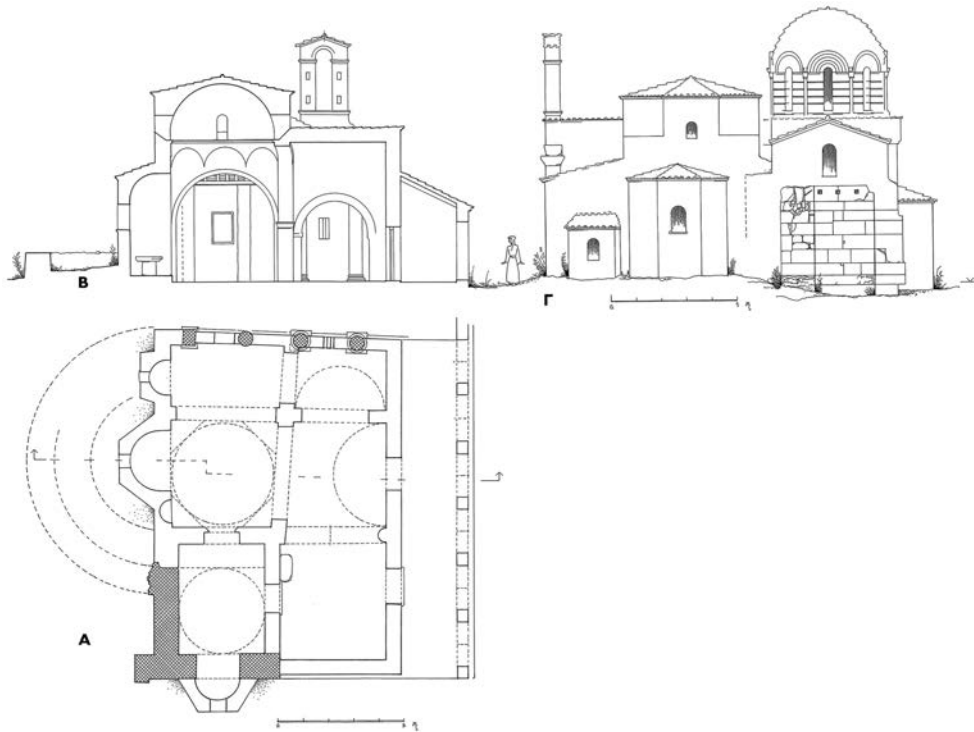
Megale Panagia in Ottoman phase. Reconstructive plan, section and elevation of the east end.
